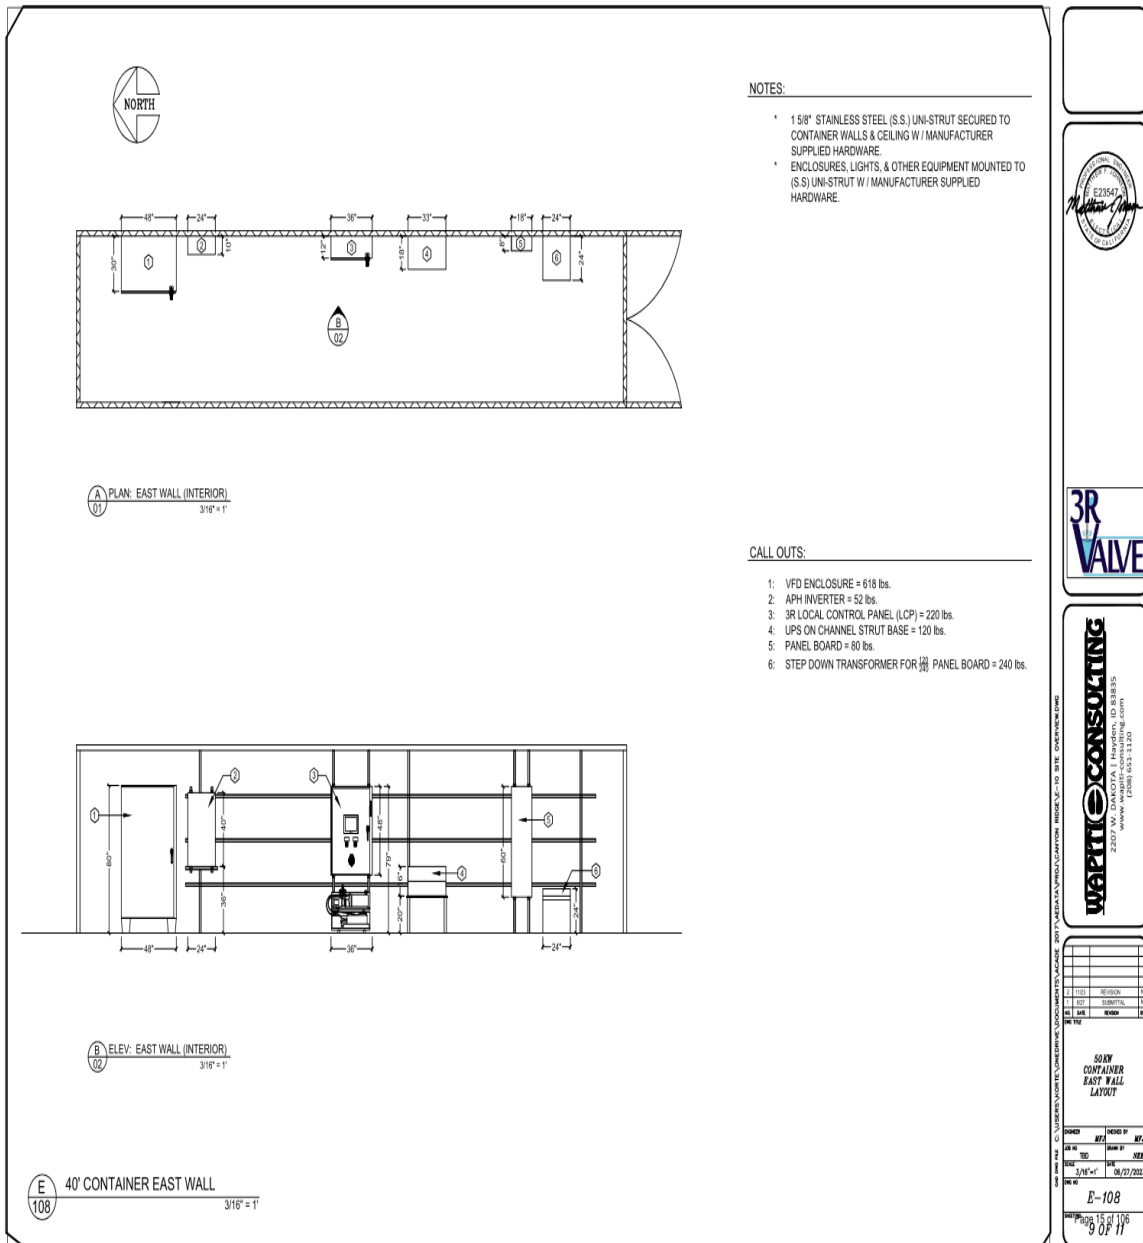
CONTAINER PLAN AND ELEVATIONS
